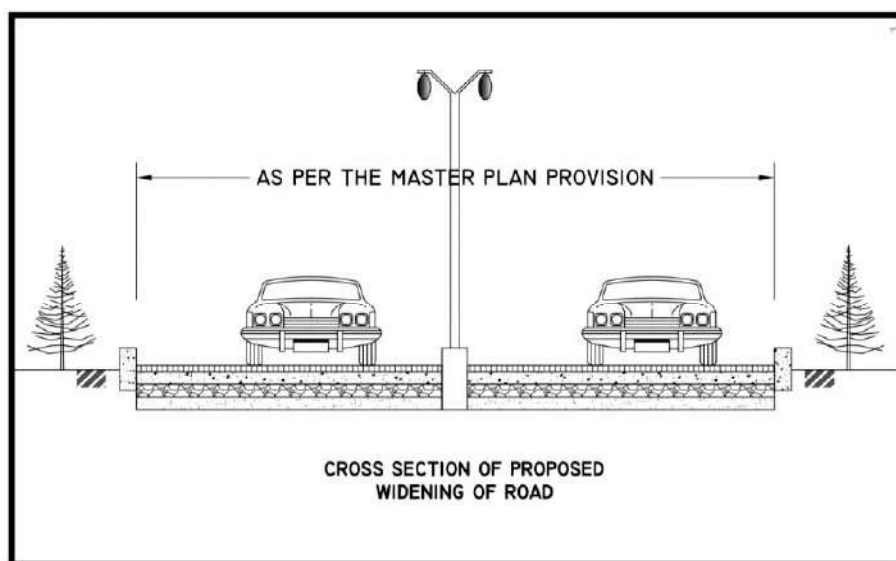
Cross-sectional drawing of proposed road widening in Jamugurihat Master Plan
